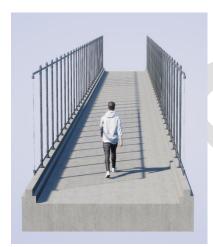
Cross Section -18th Street Ped Bridge Option 1
